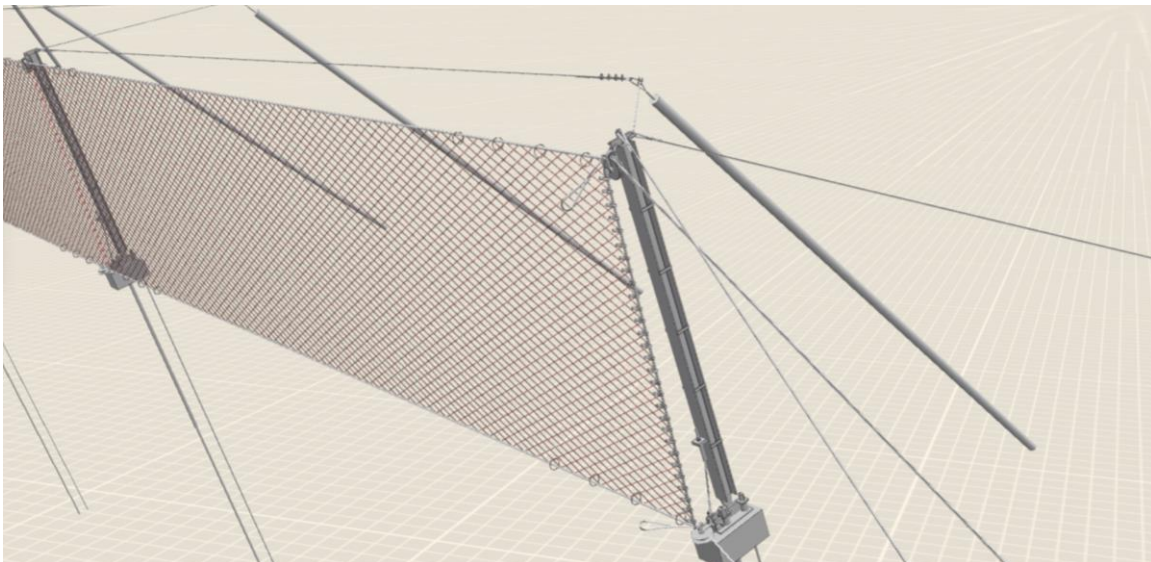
Flexible barrier with high levels of detail converted and embedded in 3DInfo
